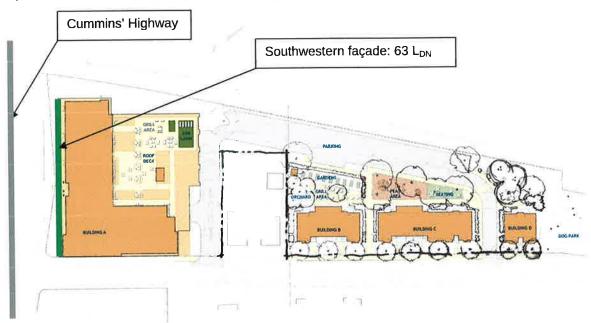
Roadway Noise Exposure to Cote Ford Site with most significant level (63 L_{DN}) along the southwestern façade of Building A (highlighted in Green).
